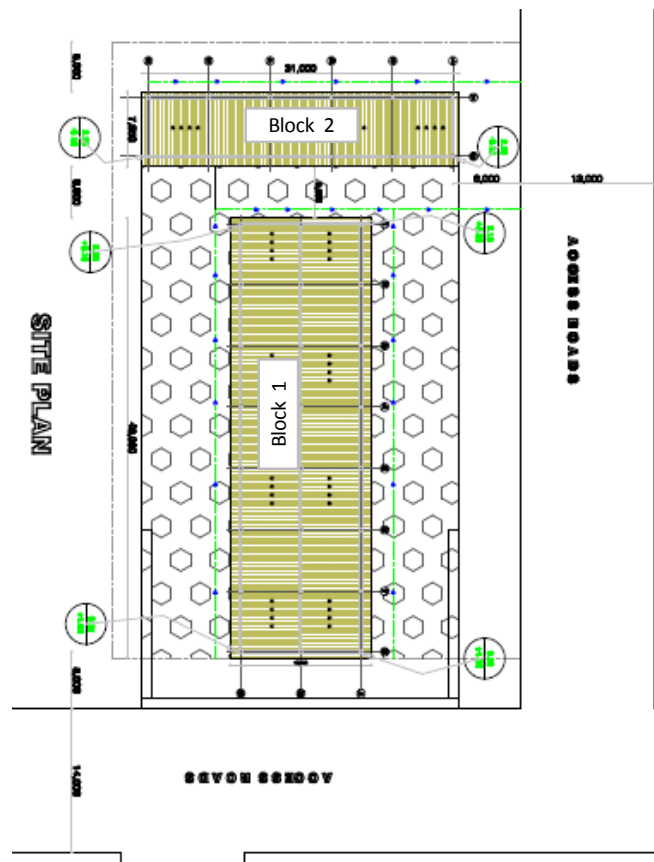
Layout of Market Facilities (Block 1 and Block 2)
